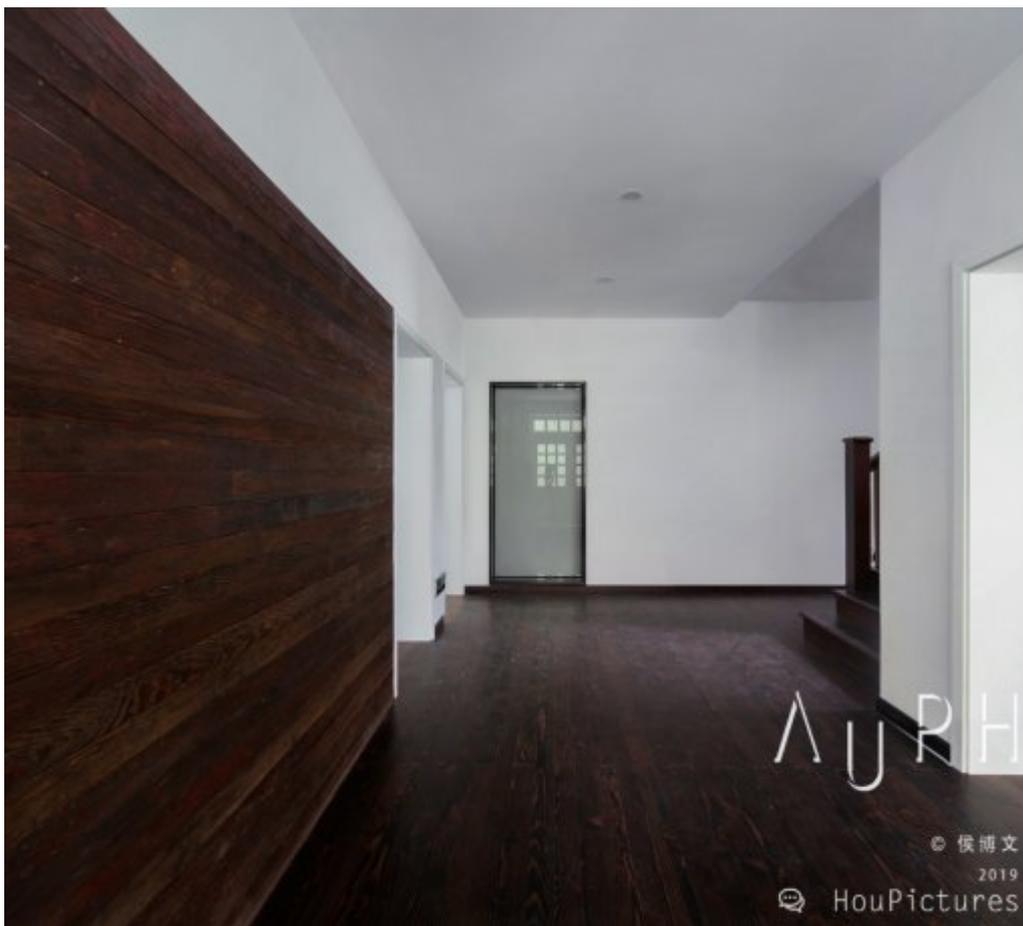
An interior wall covered by decking timbers disassembled from the ground floor
